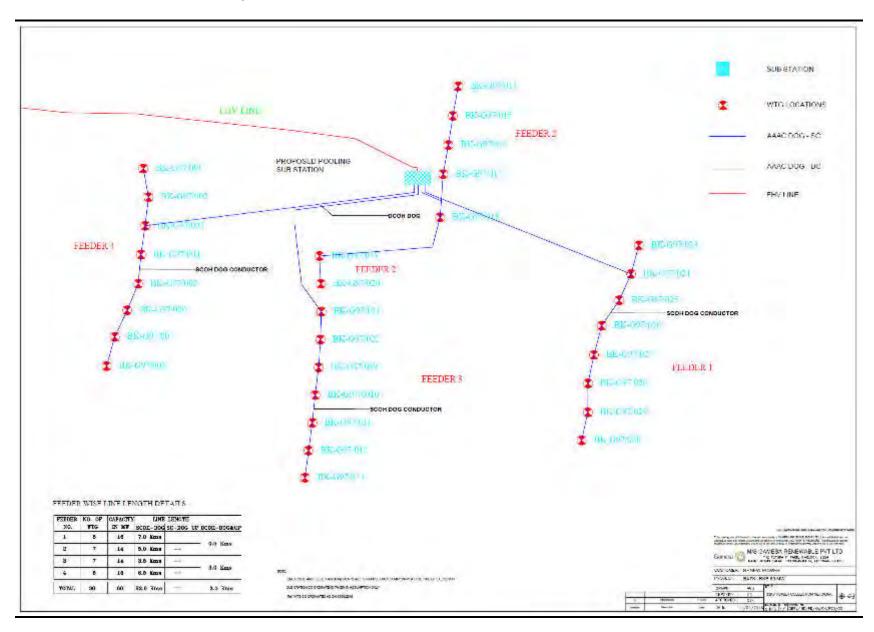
33 kV Power Collection Network of Batkurki Wind Farm
